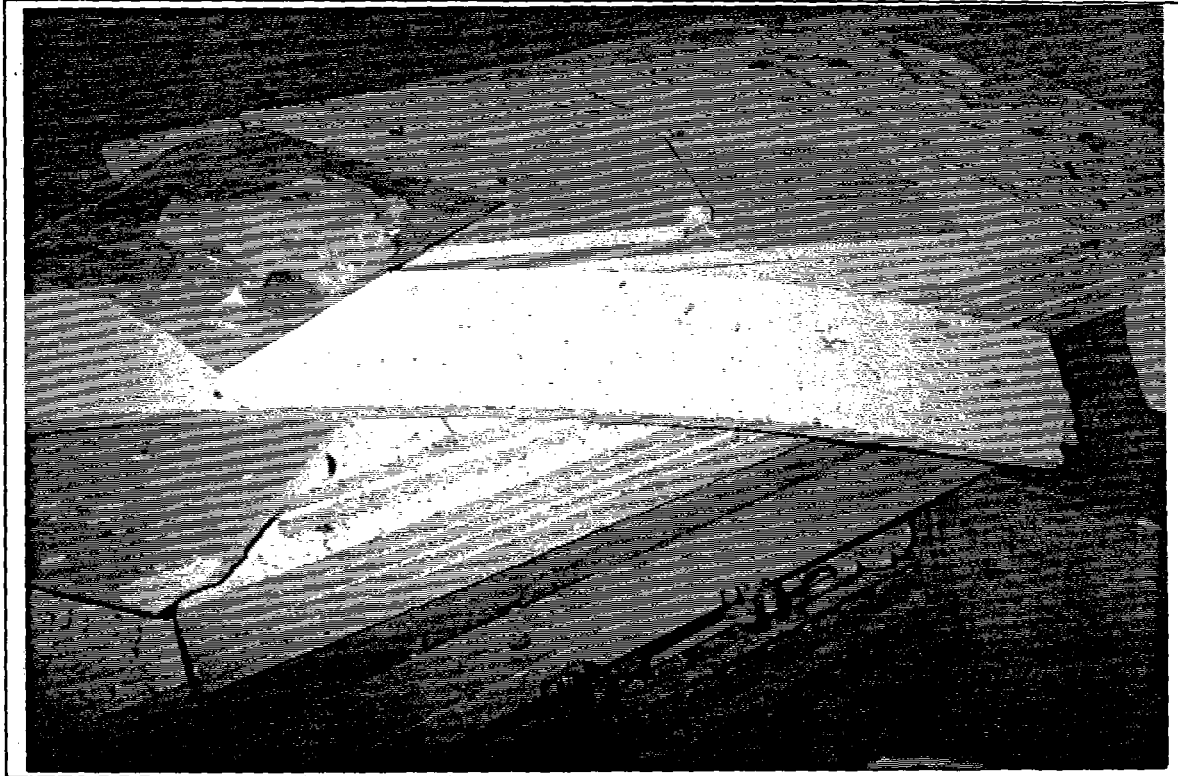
Building 30A - Non-asbestos ceiling tile removed from building interior (Sample No. 1-039).
